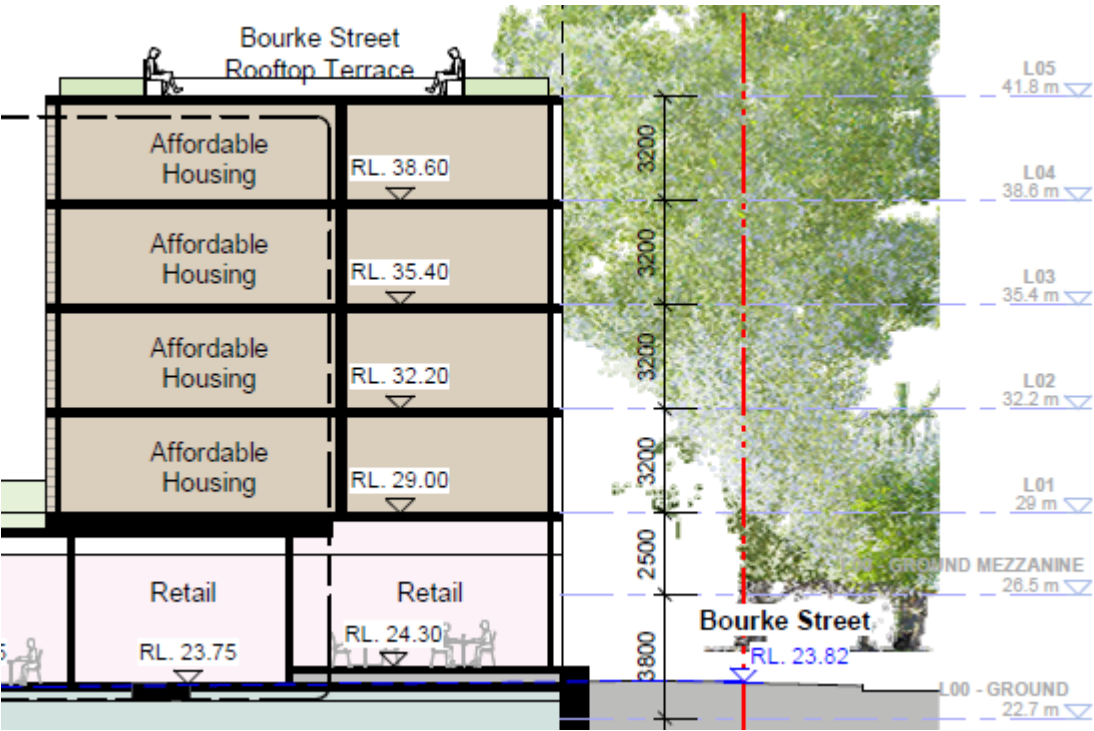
Section extract demonstrating standard floor-to-floor with double height retail ground floor
